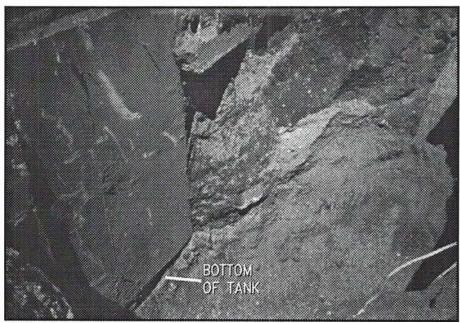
Excavation to bottom of copper filter house foundation slab (middle rear) and copper basin (left).
